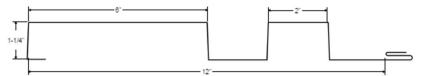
C-6 CLIP FLANGE PANELS
